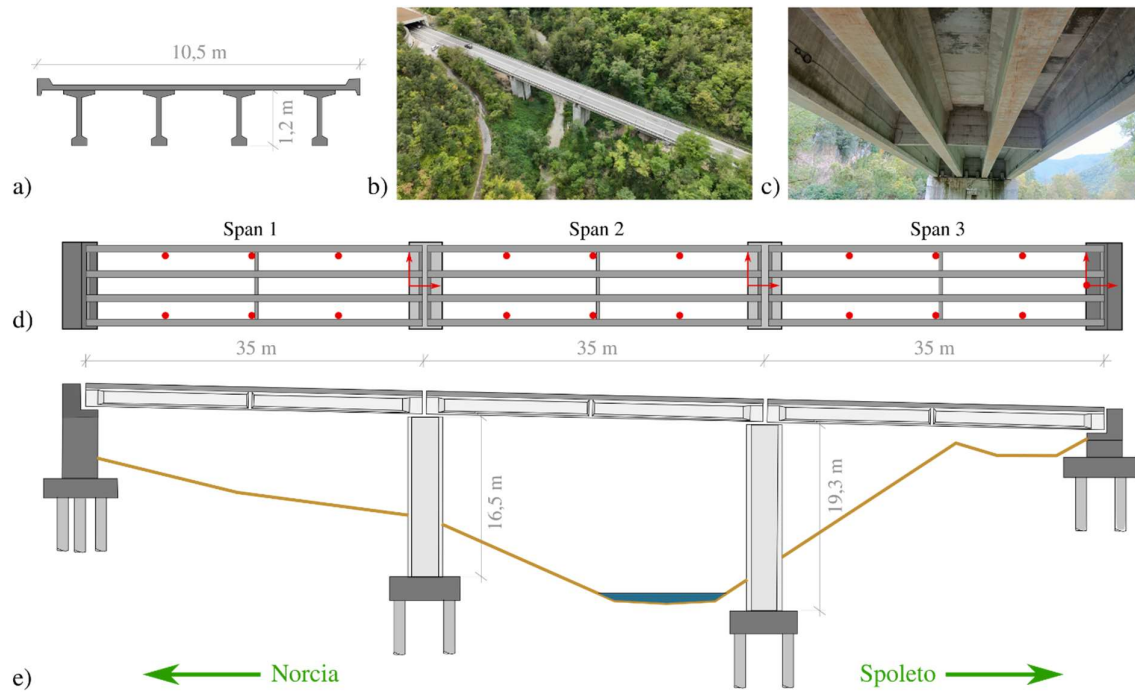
Viaduct over the Corno river. a) Cross-section. b) Picture of the entire bridge. c) Picture of the girders. d) Instrumentation set-up. e) Longitudinal drawing of the bridge.
